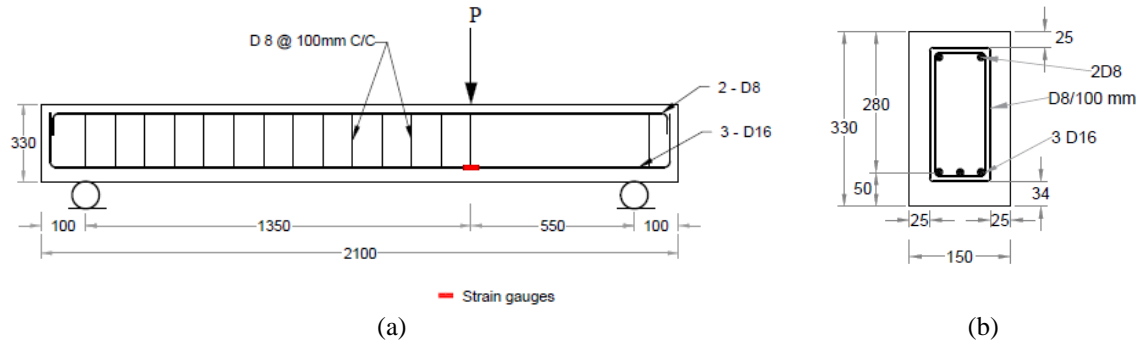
Specimen detail: (a) longitudinal detail and (b) cross-sectional detail outside the shear span (all dimensions are in mm).
